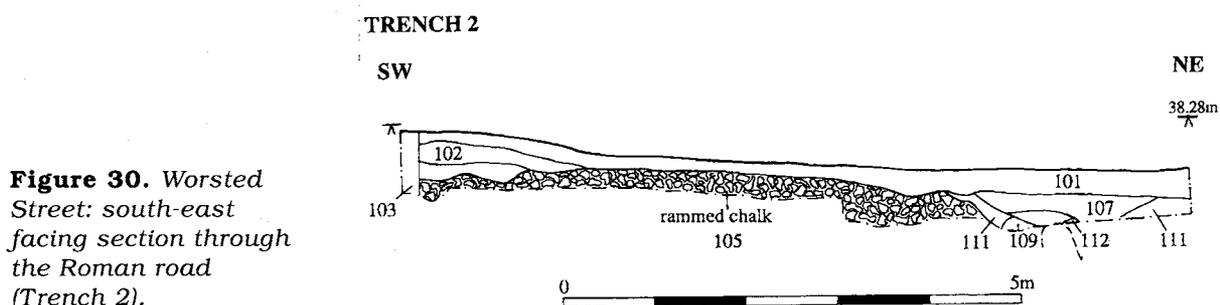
Worsted Street: south-east facing section through the Roman road (Trench 2).
